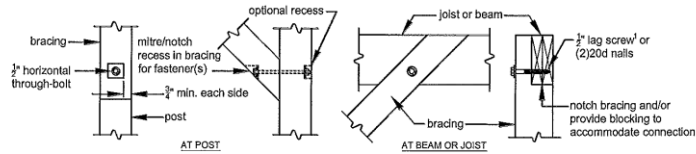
TYPICAL CONNECTIONS OF 6x6 BRACING
